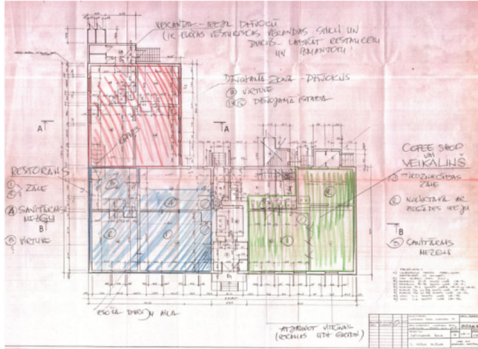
Building plan, complemented with hand sketches showing intended zoning of the building. Sketch of the owner
